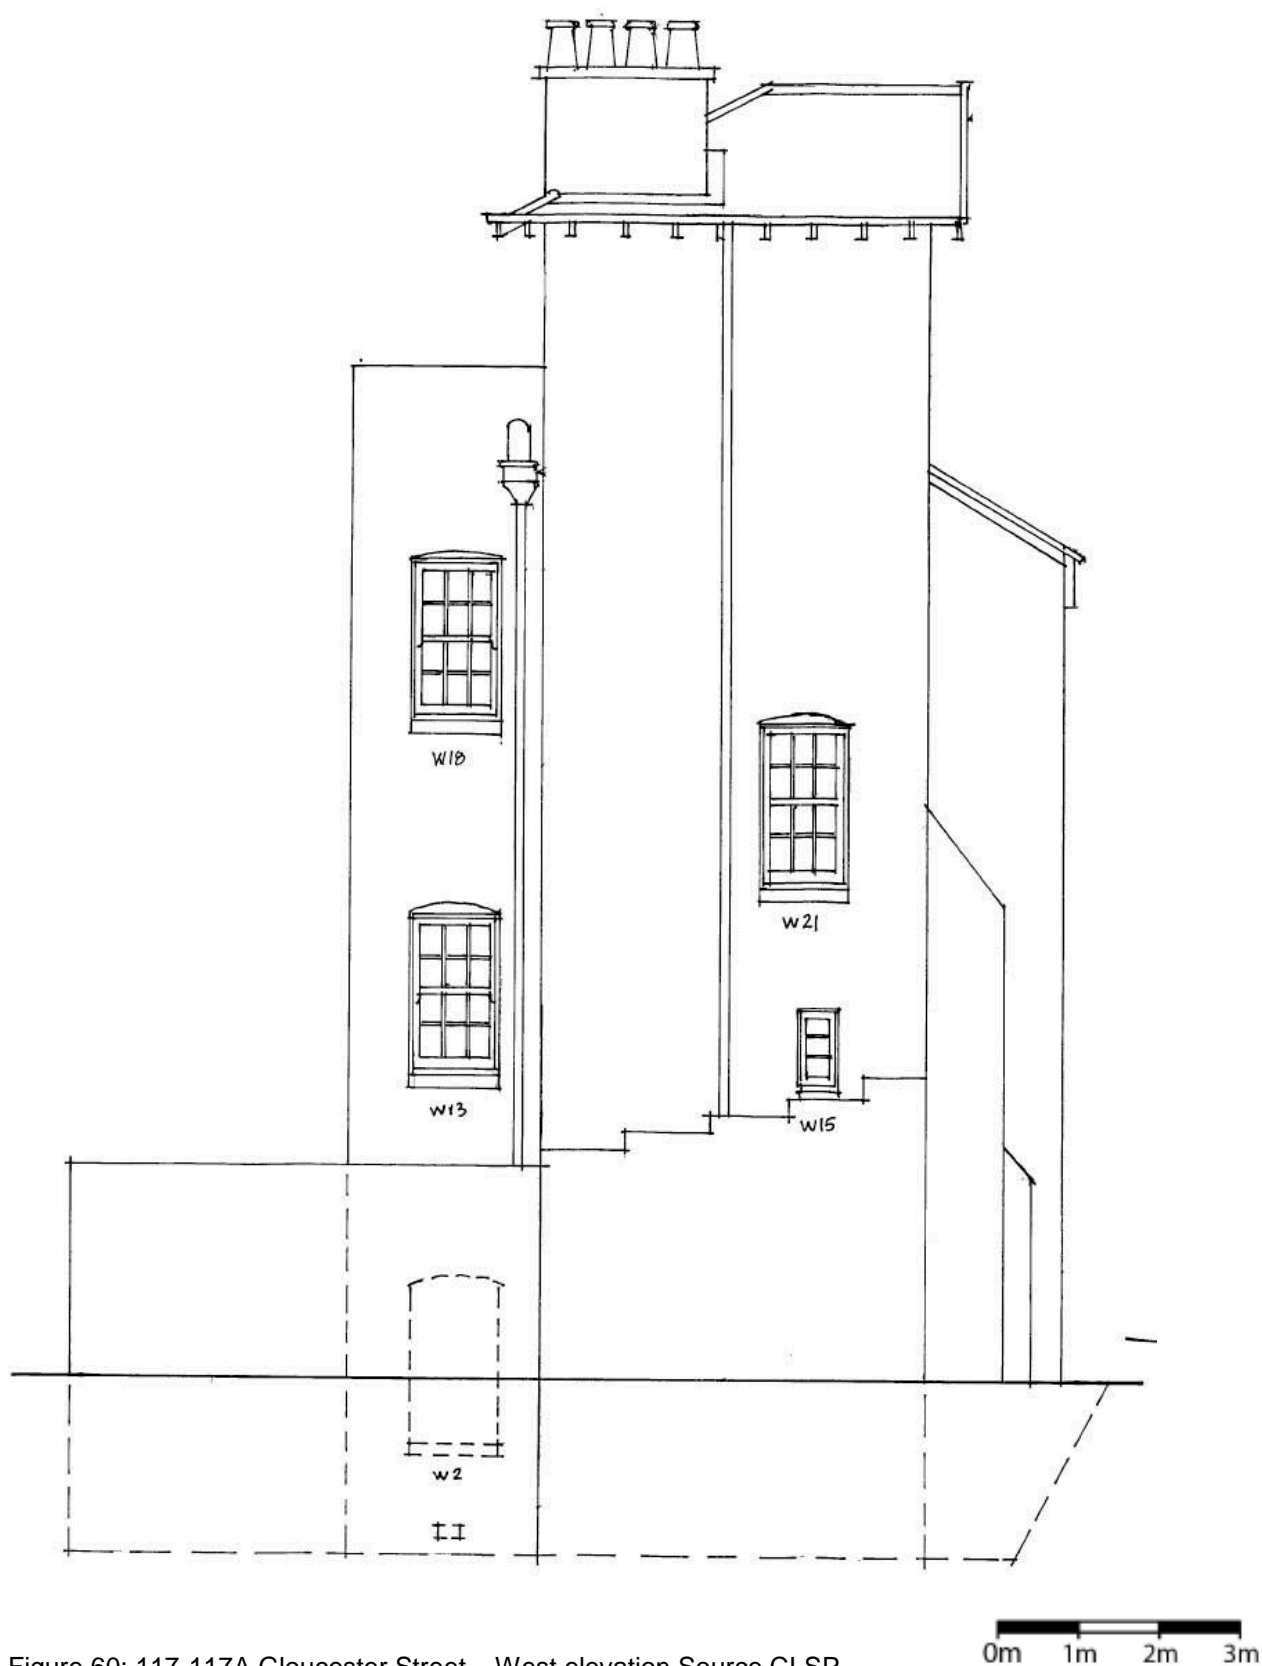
117-117A Gloucester Street – West elevation Source CLSP
